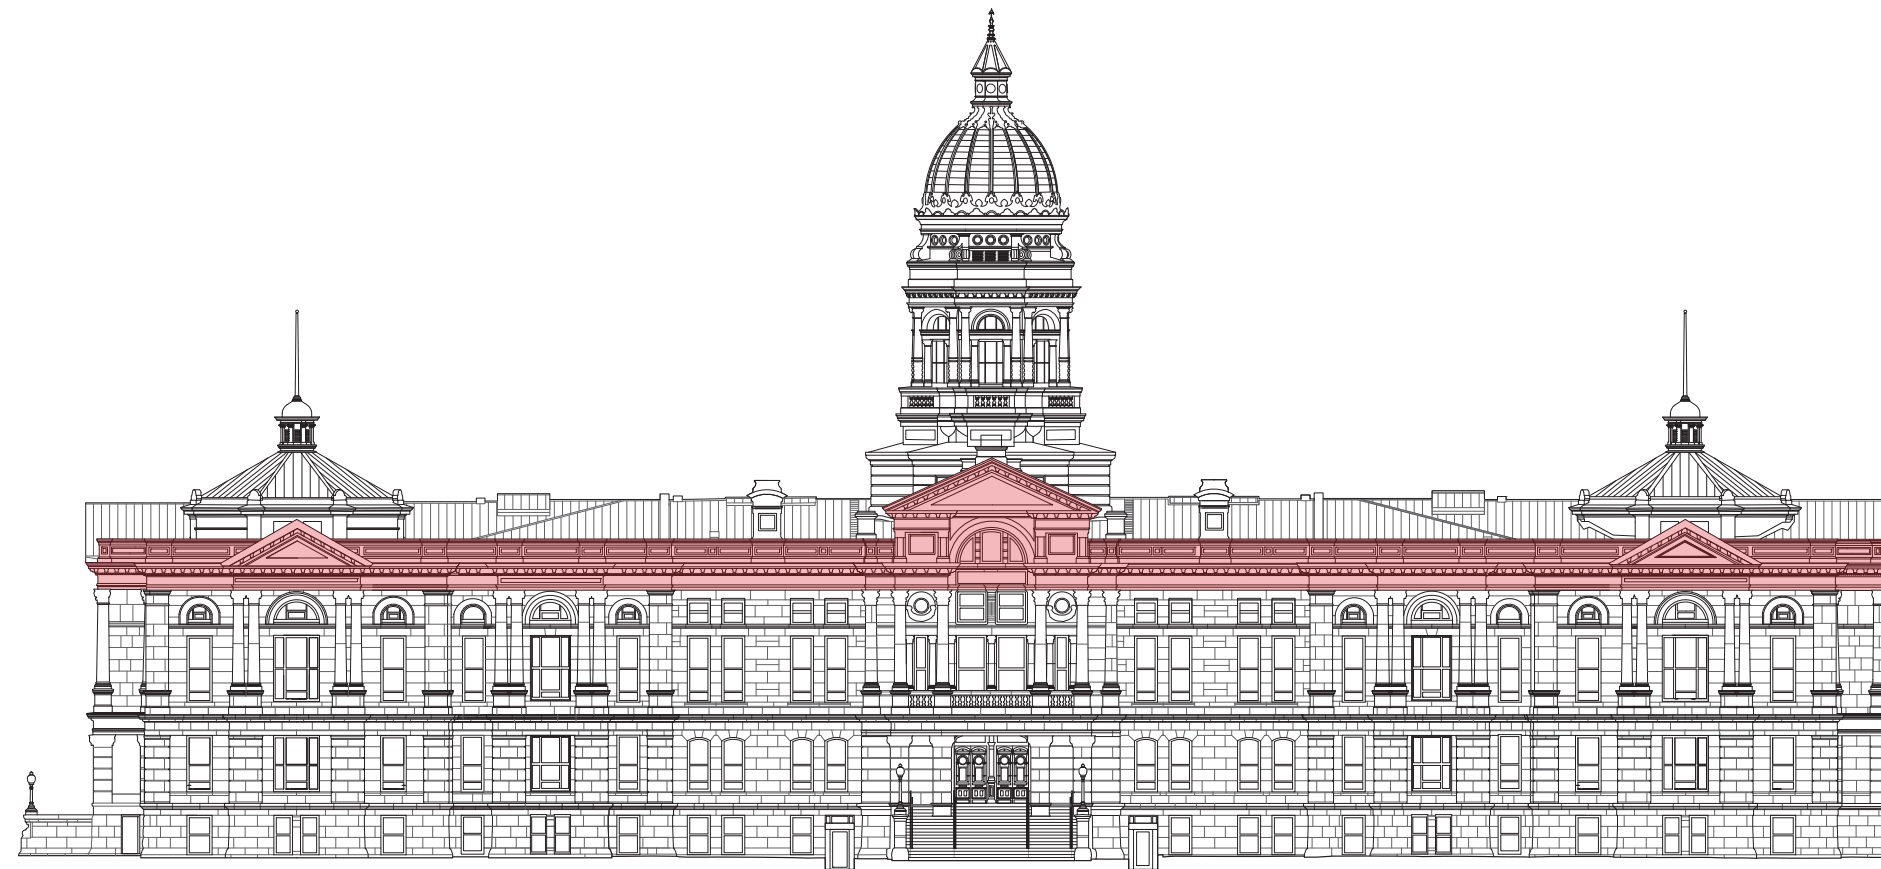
South Elevation Drawing. The cornices are indicated in red.
